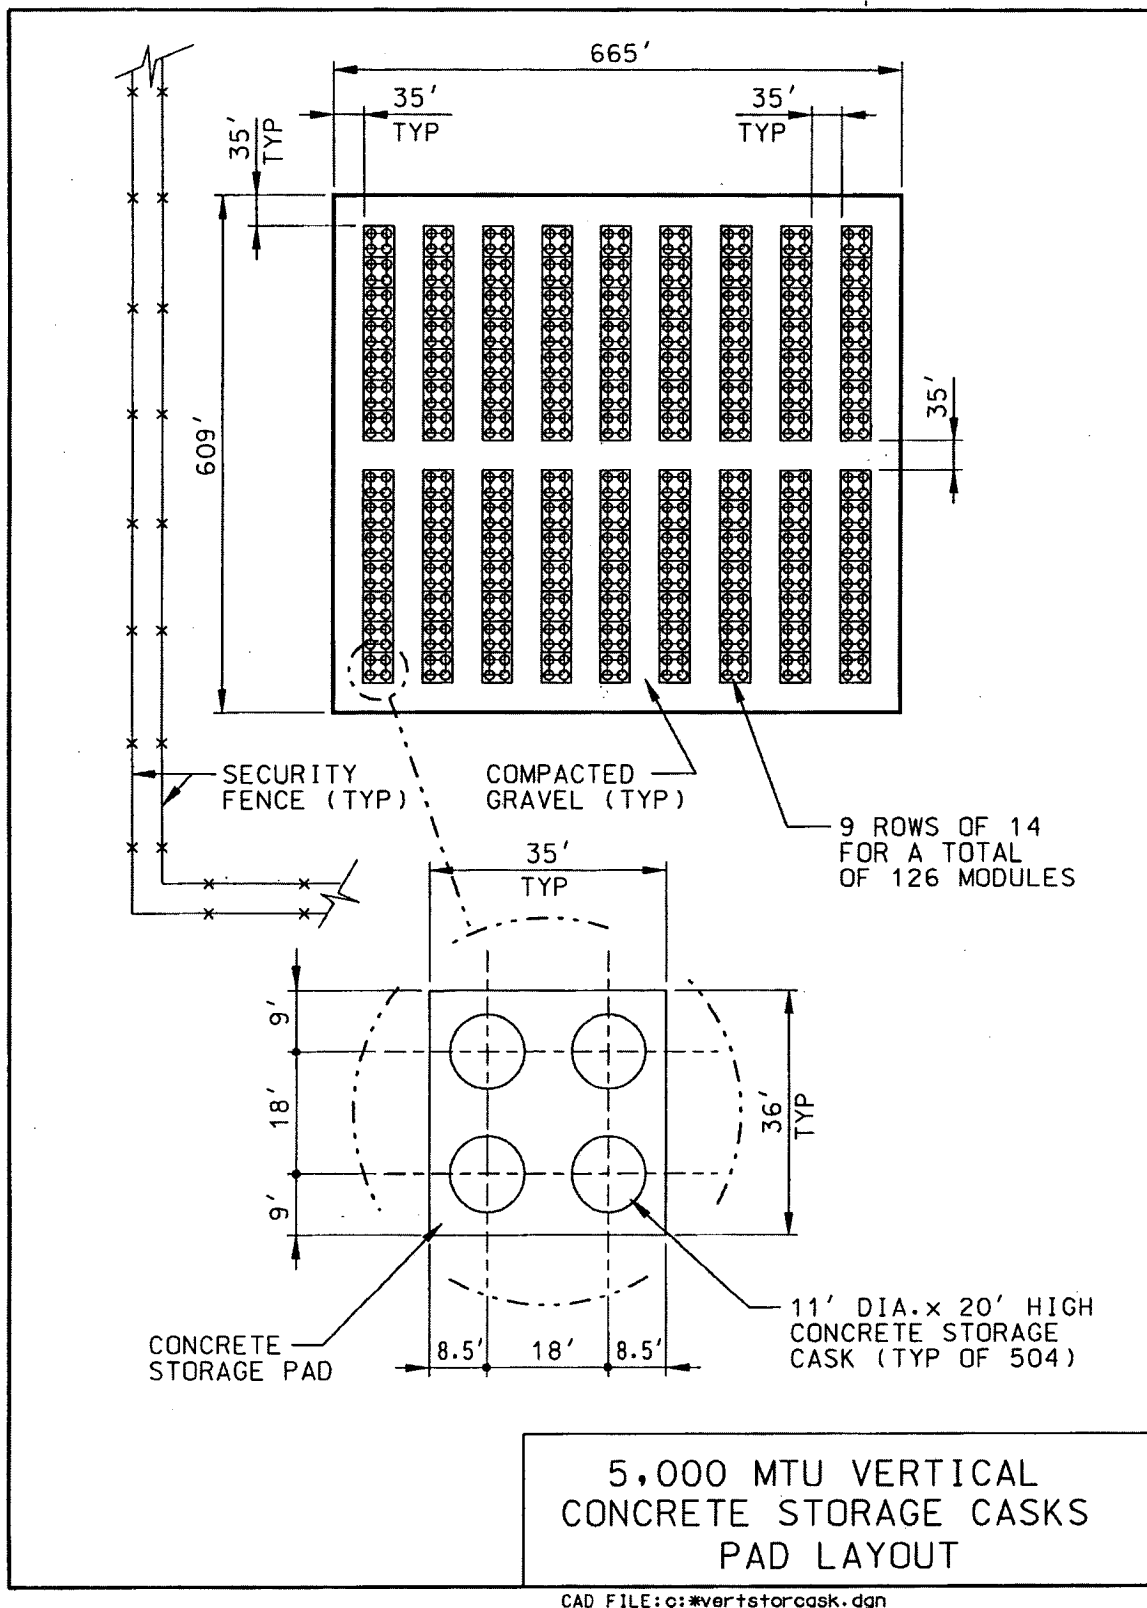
5,000 MTHM Vertical Concrete Storage Casks Pad Layout
